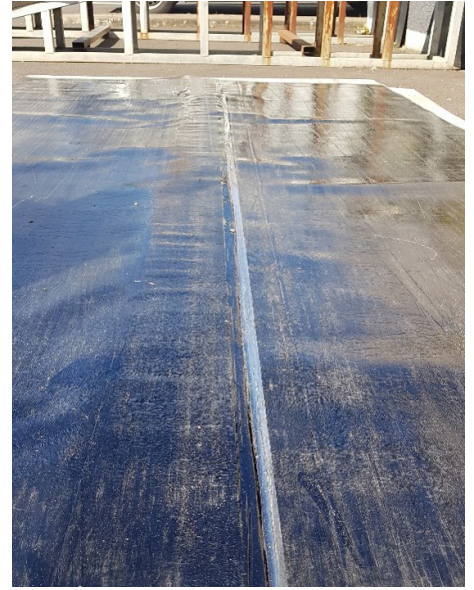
View of Teranap TP631 turned upside down after Bitumat B2 welding to illustrate the straight lines on the weld.
